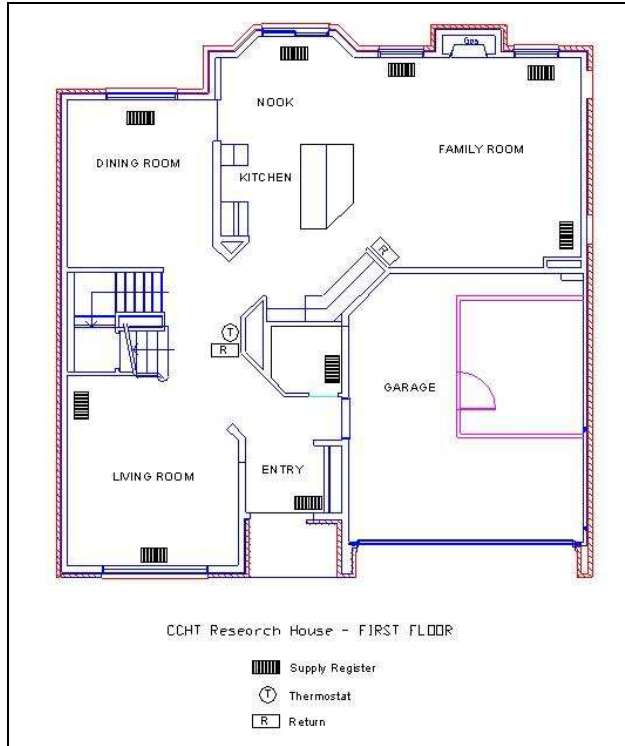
Layout, 1<sup>st</sup> Floor of CCHT Houses.
